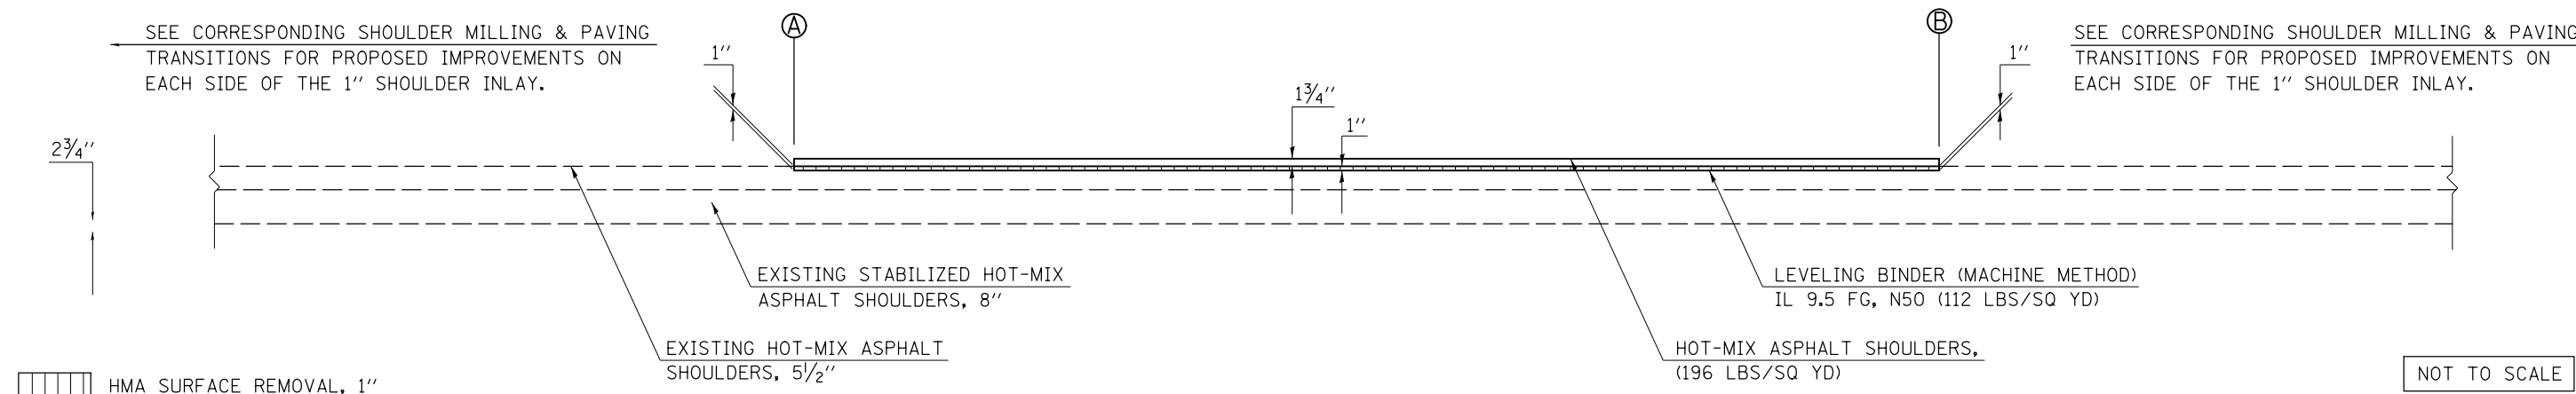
MAINLINE SHOULDER MILLING & PAVING TRANSITION
